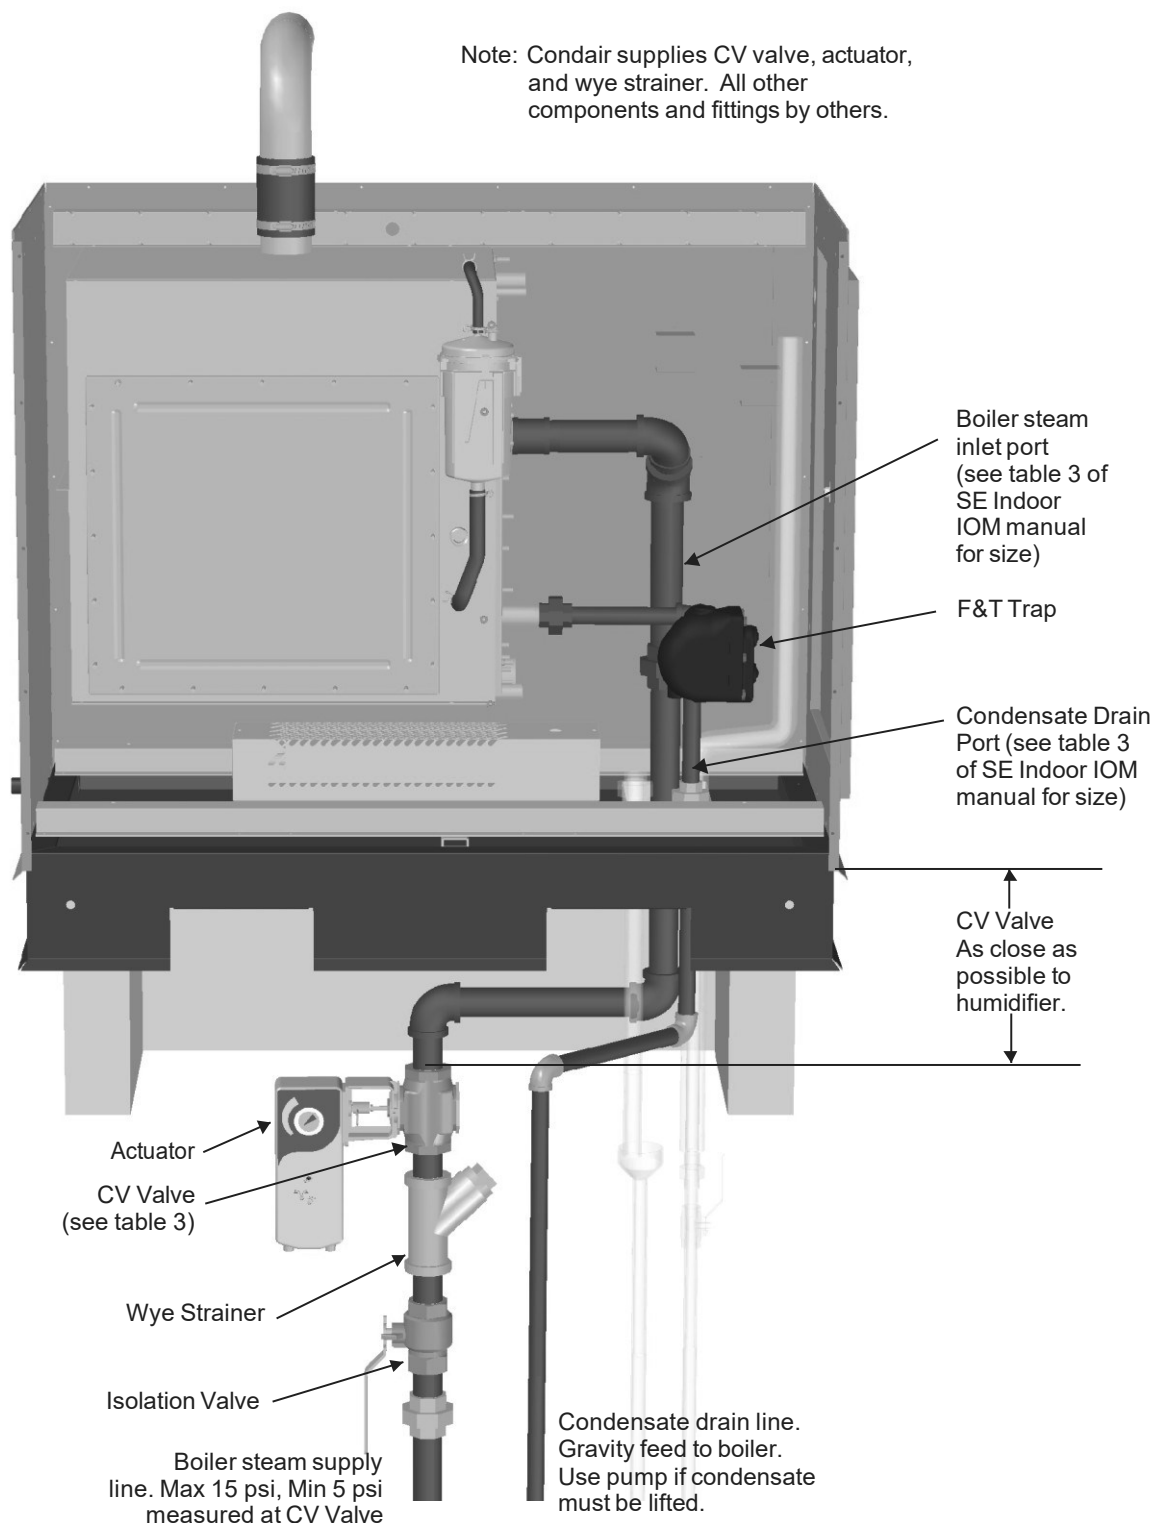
Condair SETC Outdoor Boiler Steam and Condensate Connection
